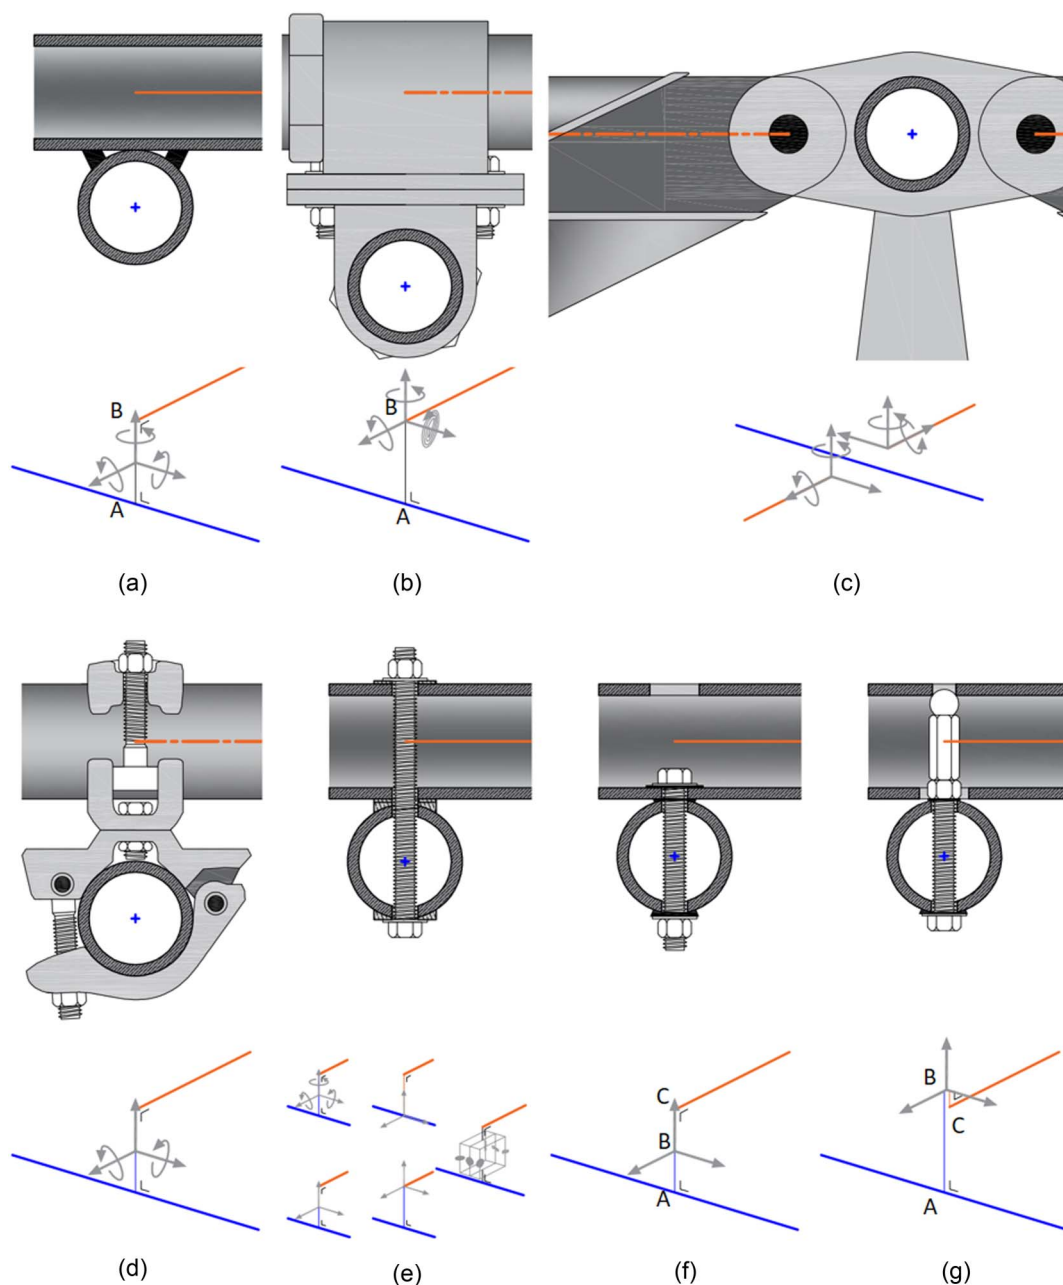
(a) Welded connection; (b) rigid bolted connection; (c) bolted pinned connection; (d) scaffolding swivel connector; (e) fully through-bolt connection; (f) partially through-bolt connection; and (g) ball-based connection.
